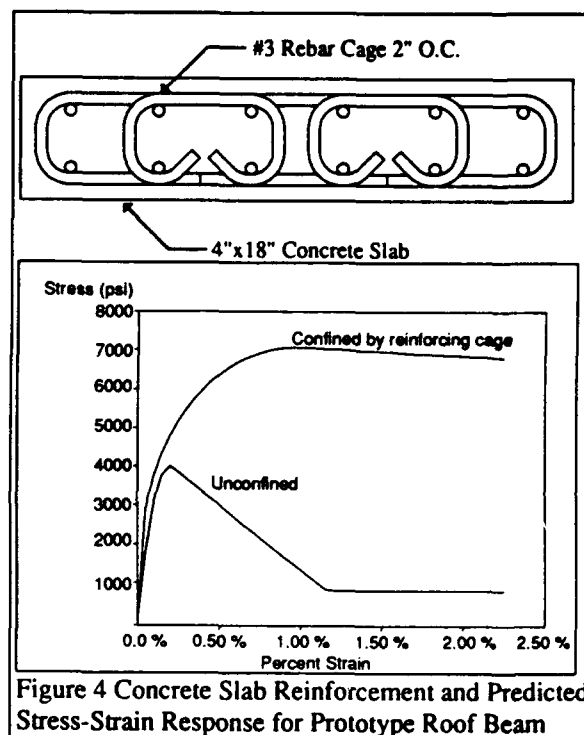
Concrete Slab Reinforcement and Predicted Stress-Strain Response for Prototype Roof Beam
